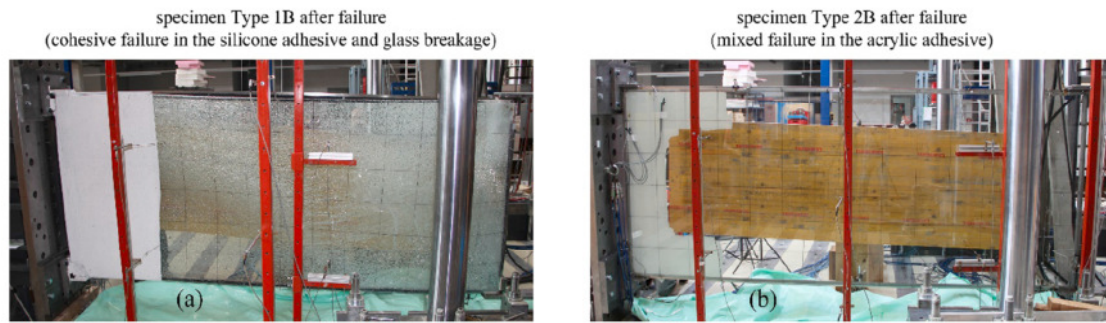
Front views of specimen Type 1B (a) and of specimen Type 2B (b) after failure.
